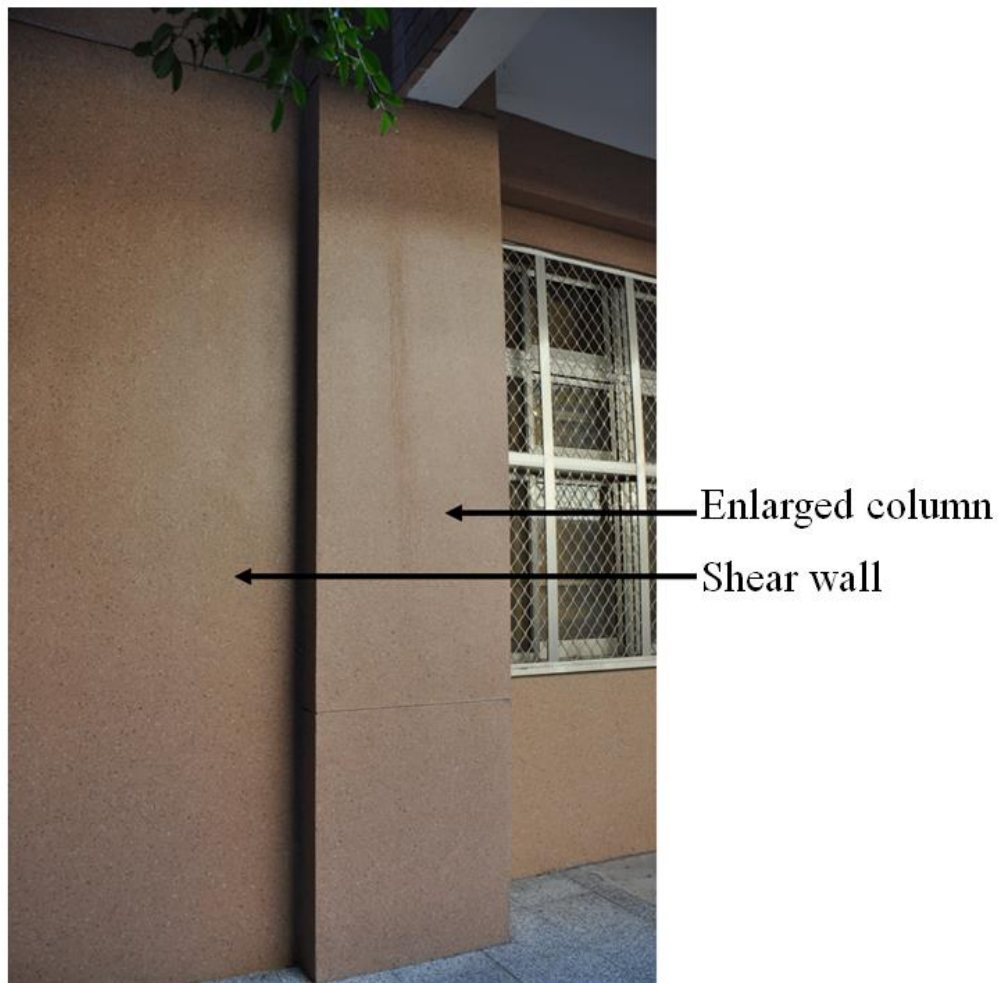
The RC shear wall reinforcement method (Chung, 2009)
